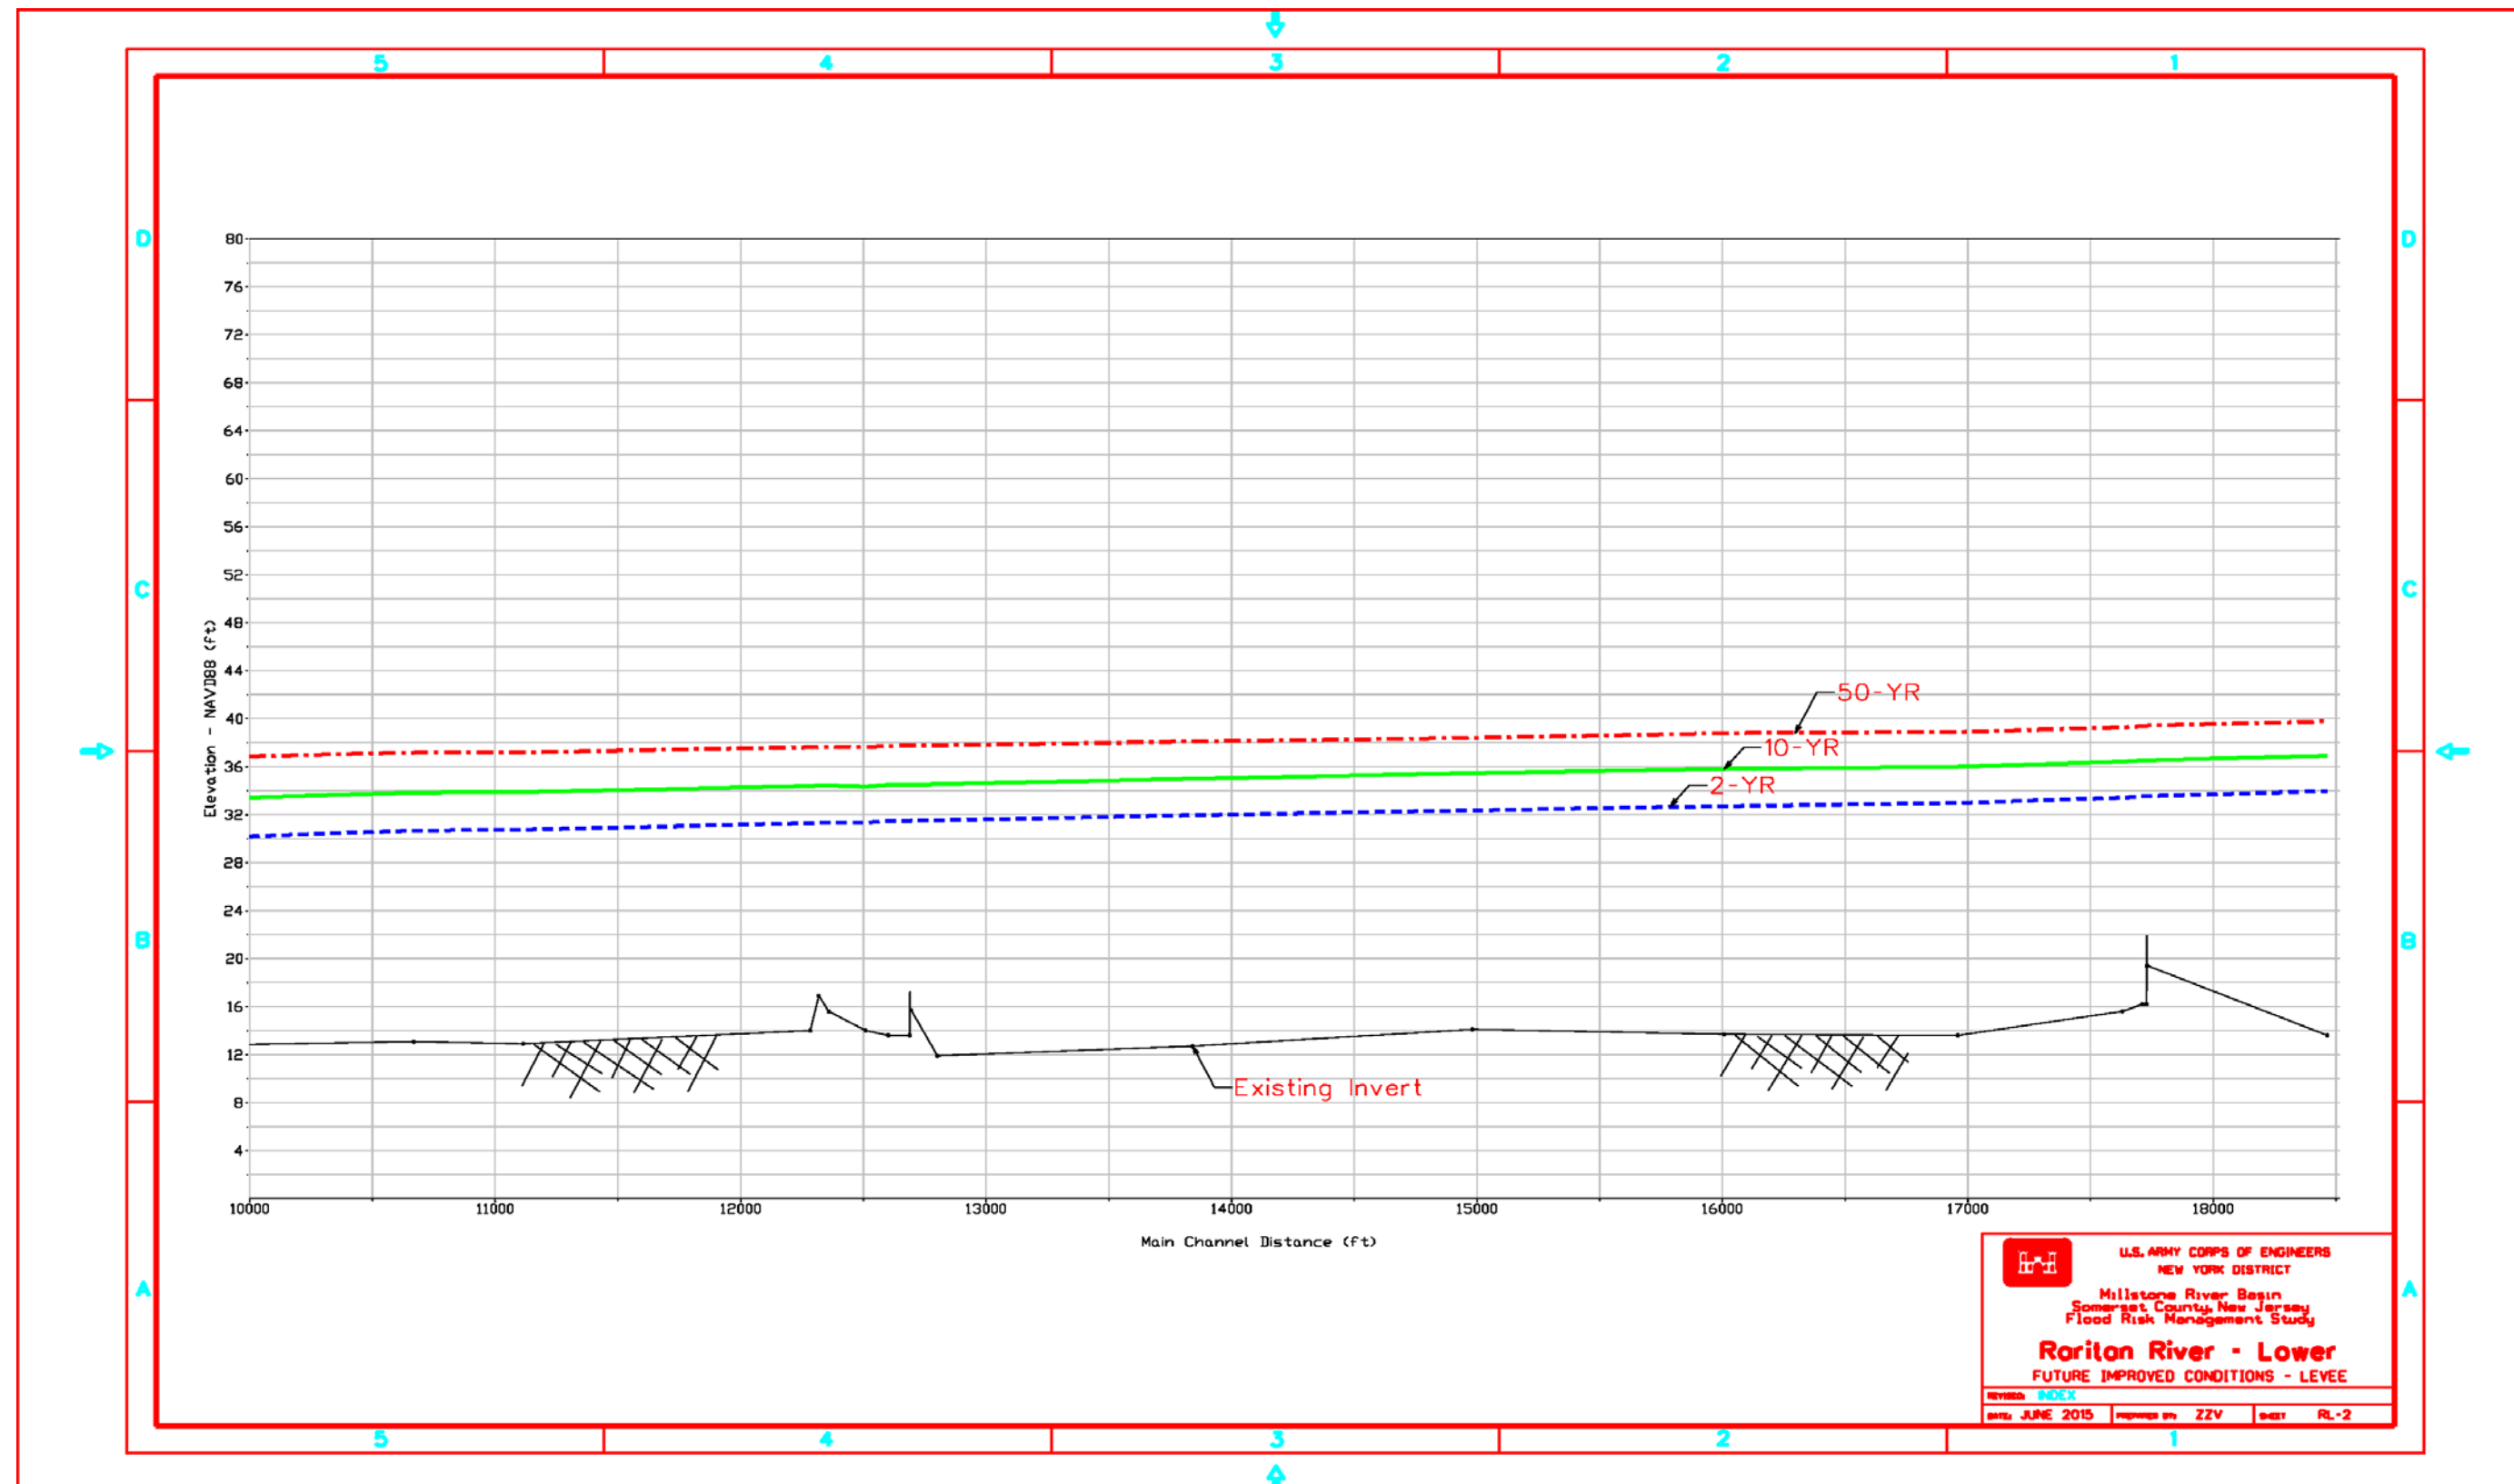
MAXIMUM WATER SURFACE PROFILE FOR LEVEE & FLOODWALL PLAN - FUTURE IMPROVED CONDITIONS (RARITAN RIVER LOWER)
